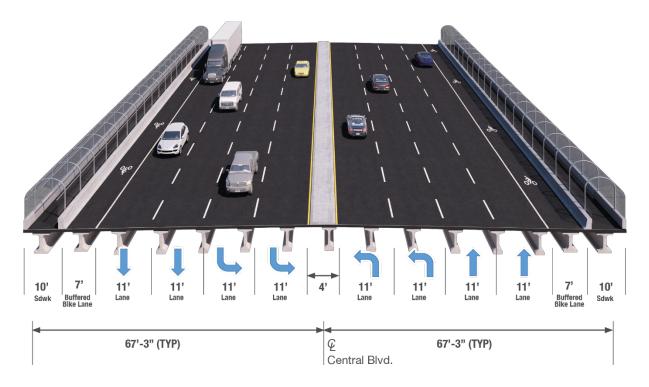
Typical Section – I-95 North of Central Boulevard (Mainline Alternatives 2 and 3)
